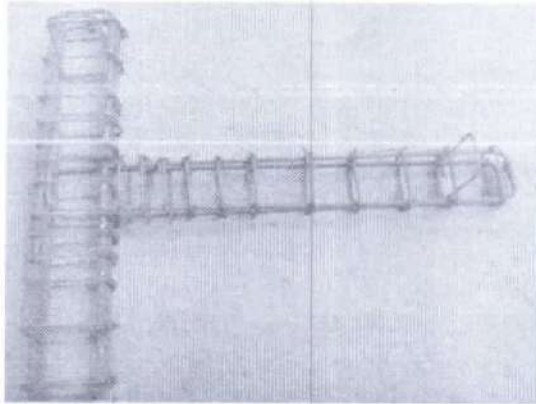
Detailing of reinforcement (Beam-Column joint)
